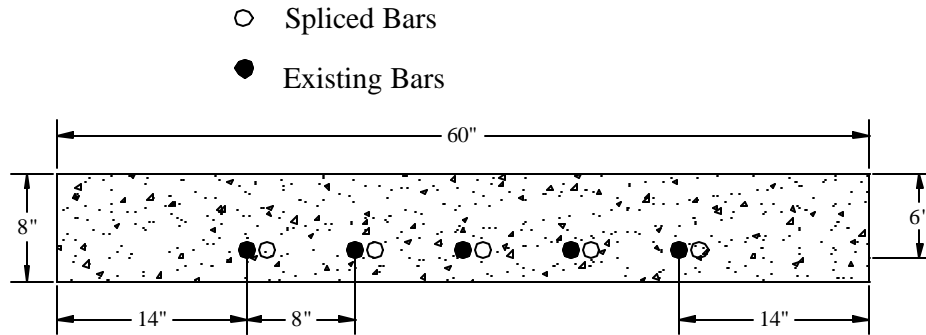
Test Series 4, Specimen B and D reinforcement spacing and depth
